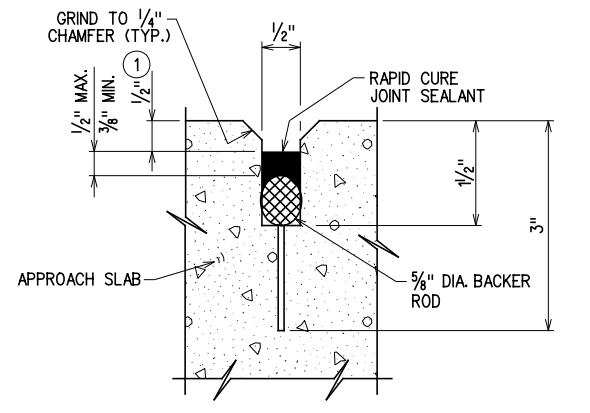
DETAIL OF RAPID CURE JOINT SEALANT BETWEEN WING WALL AND APPROACH SLAB
